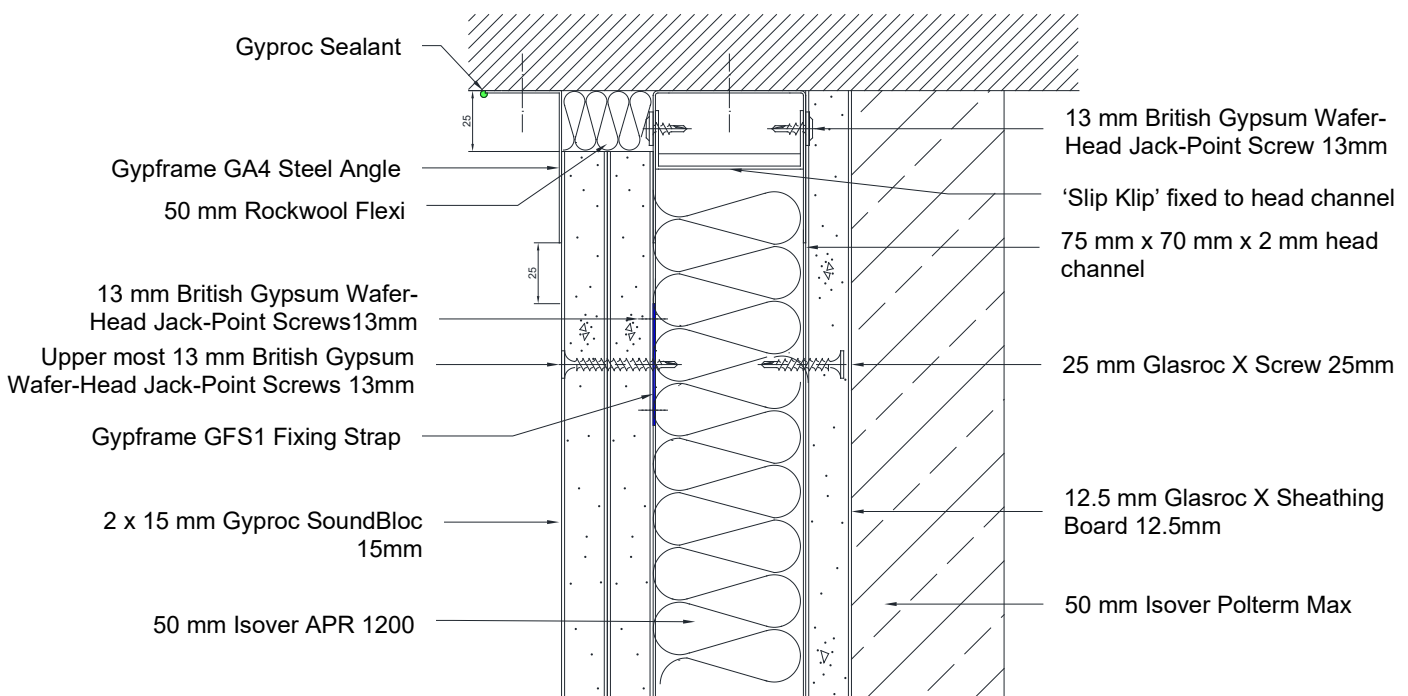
Vertical cross section – SFS external wall system with a 70 mm cold-rolled structural steel stud framework clad on the one side with a double layer of 15 mm Gyproc SoundBloc 15mm and on the other with an inner layer of 12.5 mm Glasroc X Sheathing Board 12.5mm and an outer layer of 50 mm Polterm insulation with 50 mm Isover APR 1200 in the cavity, incorporating a 20 mm deflection head.
